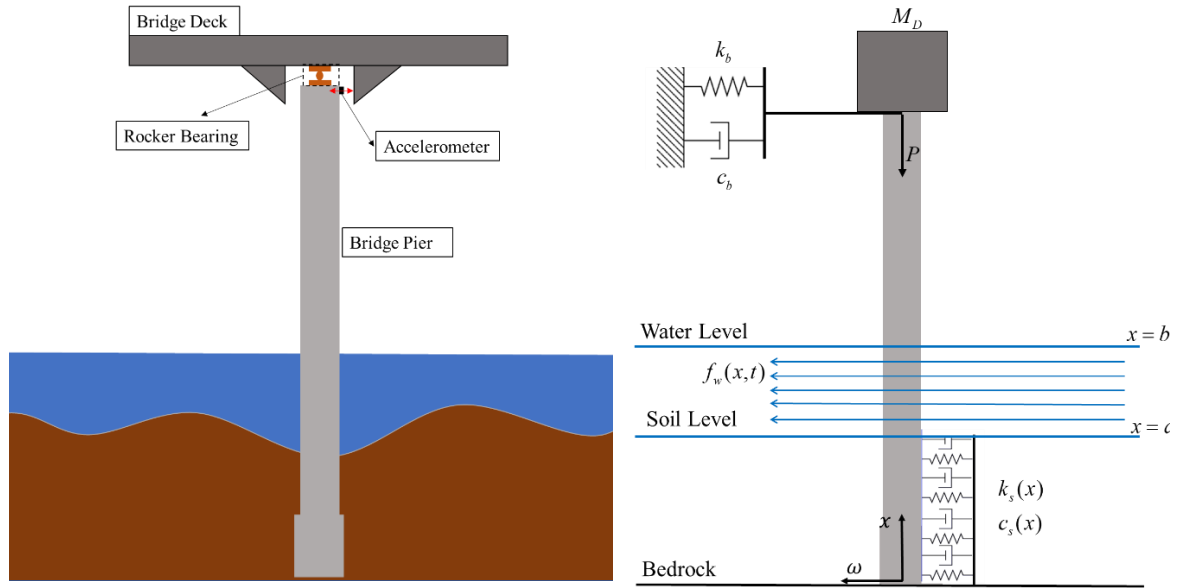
Schematic view of Euler beam model of a bridge pier with rocker bearings
